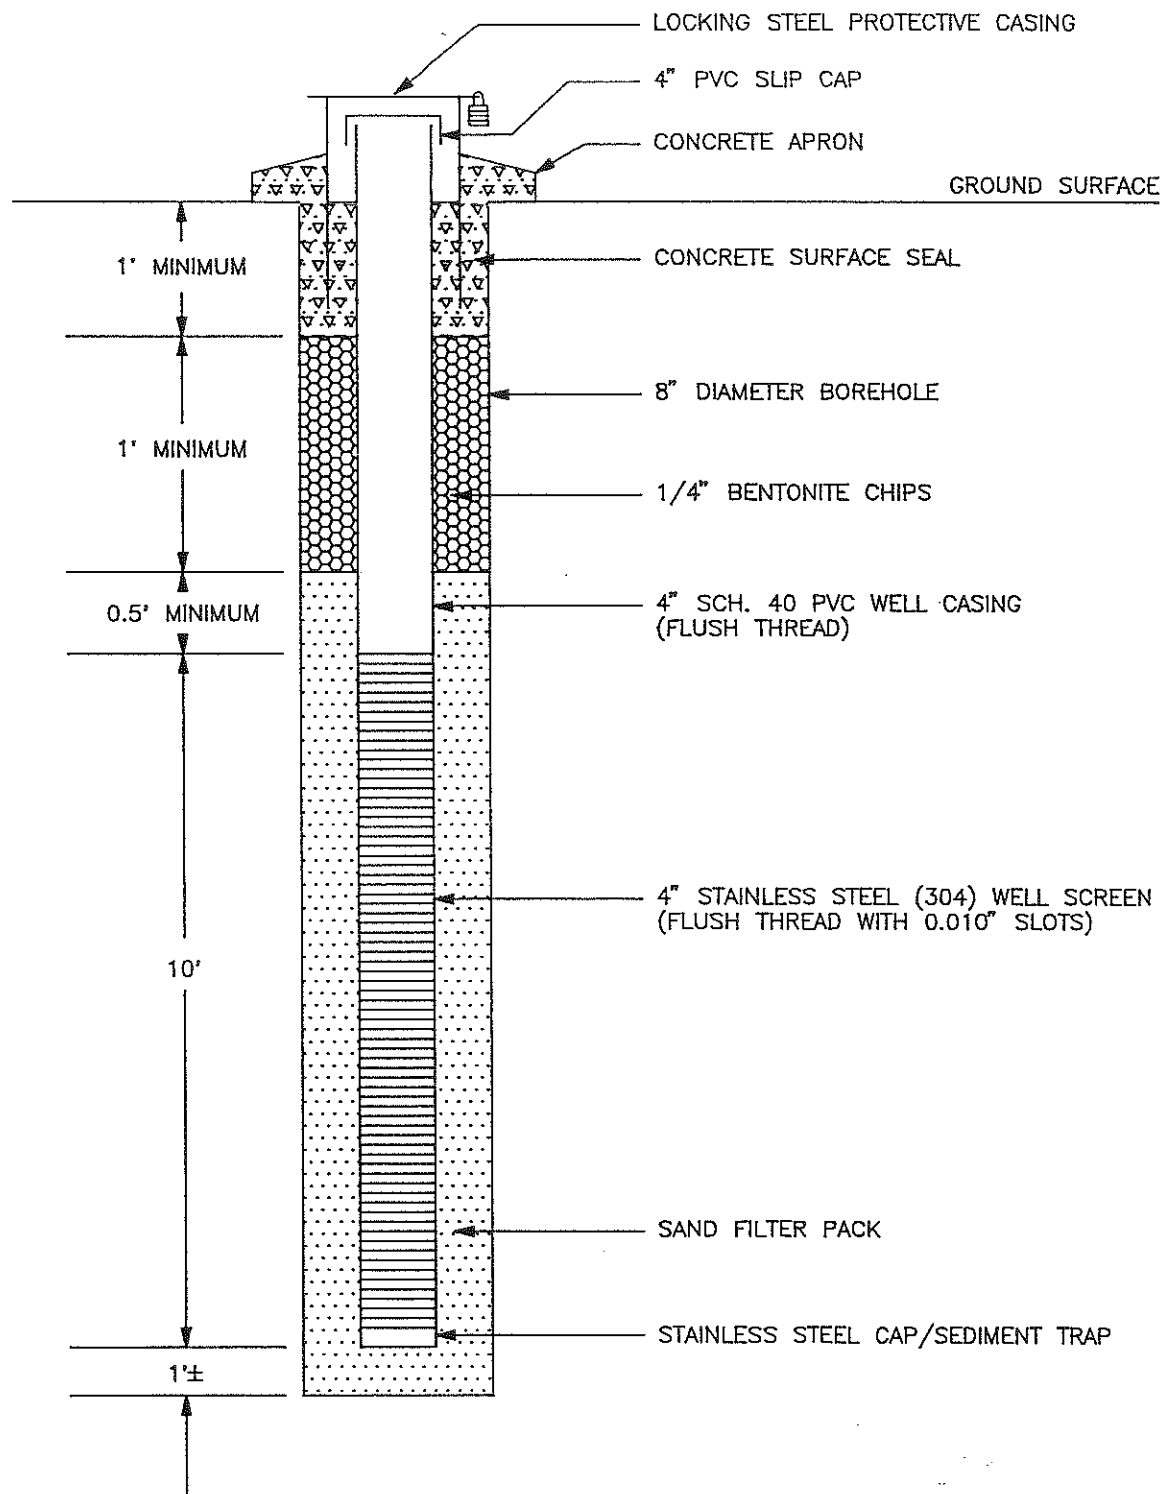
TYPICAL MONITORING WELL COMPLETION DETAIL
